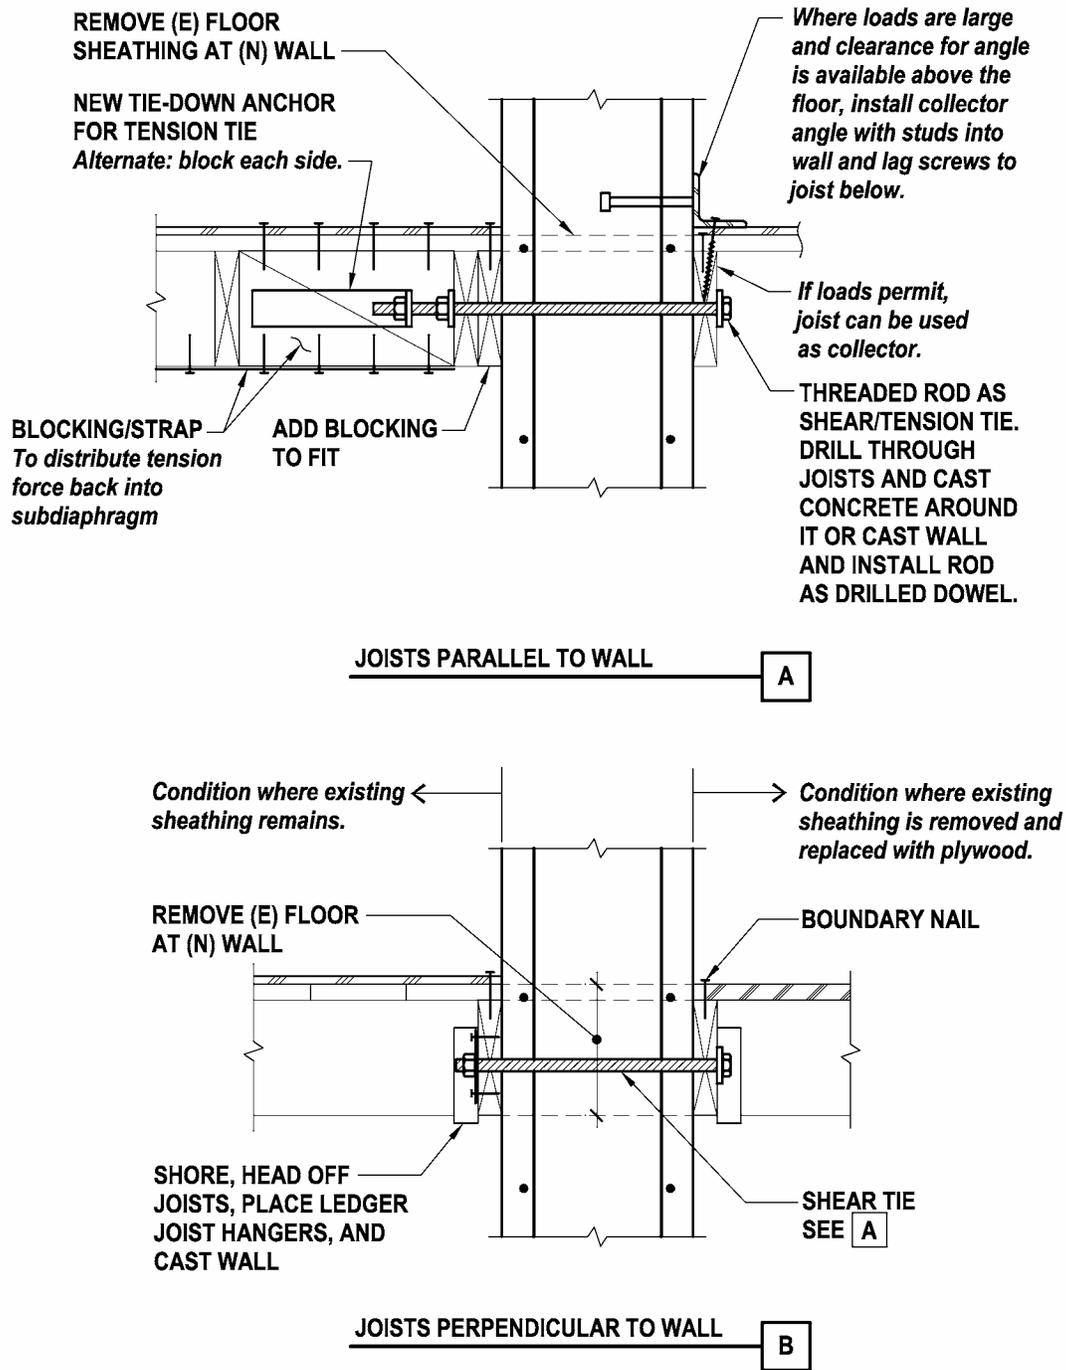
Connecting a New Concrete Wall to an Existing Wood Floor
